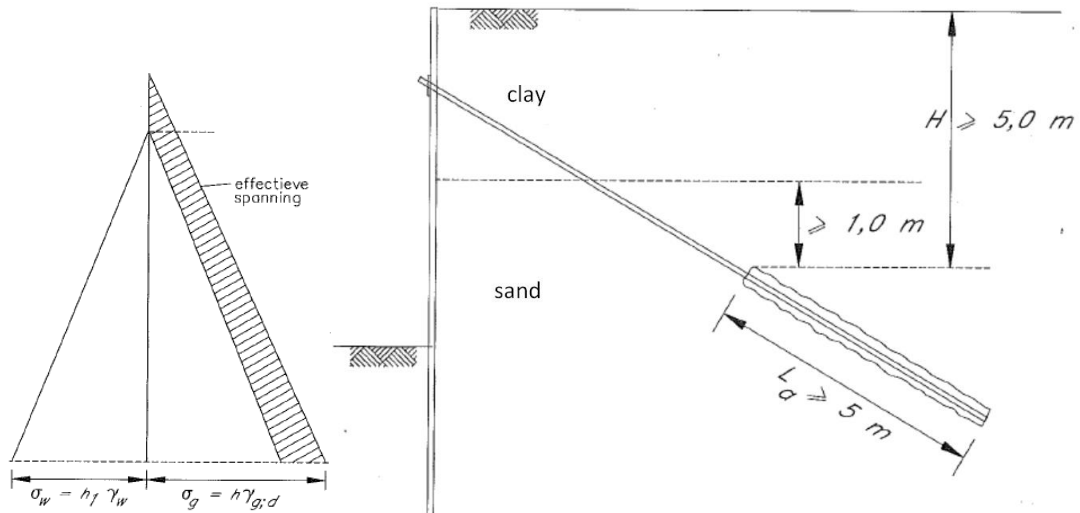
water and grout pressure (left) and the requirements for grout anchors (CURNET, 2012)
